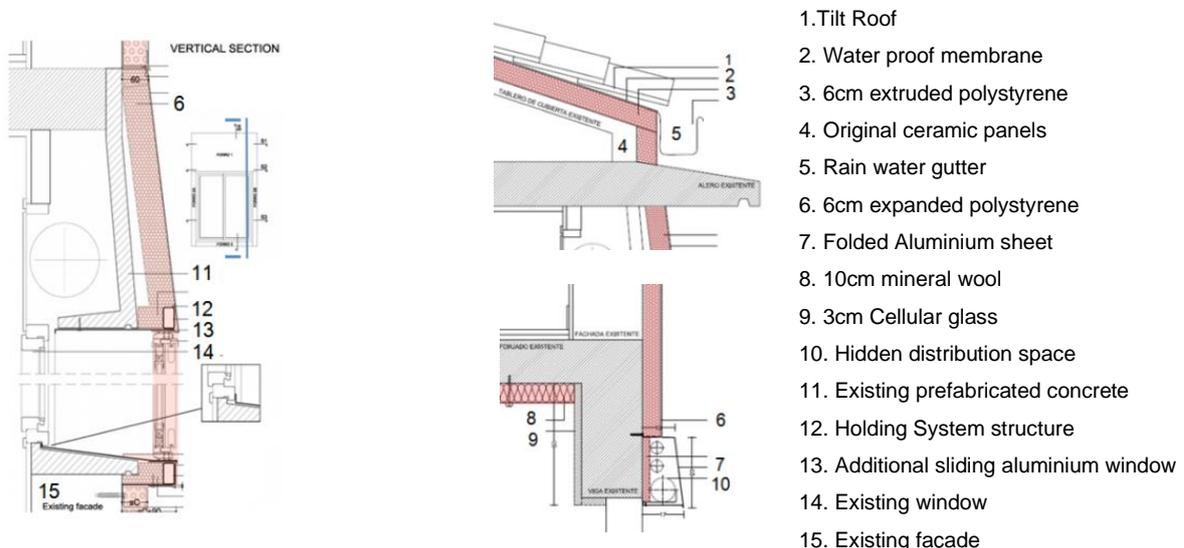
Construction details of renovation solution. Source: M.A.R. Arquitectos.
